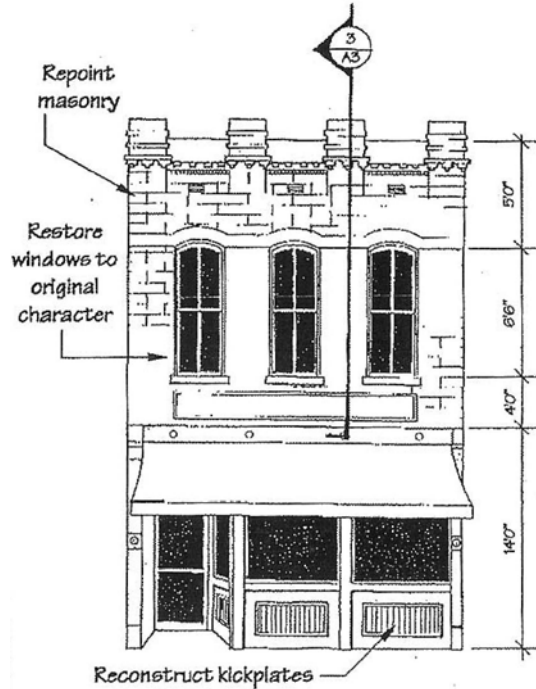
Variations in wall plane are articulated in the exterior trim, awnings and various architectural details.
